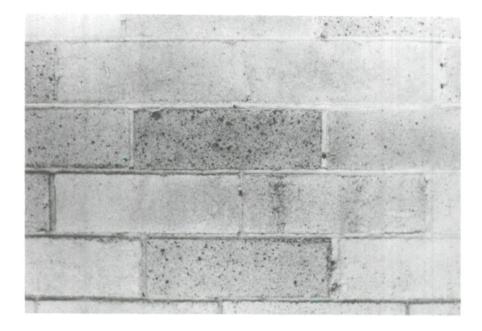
A fine example of a Clayburn pressed, speckled buff face brick, shown in the exterior wall of the Clayburn plant manager's house, erected 1907, Clayburn village. (Photo by the author.)
